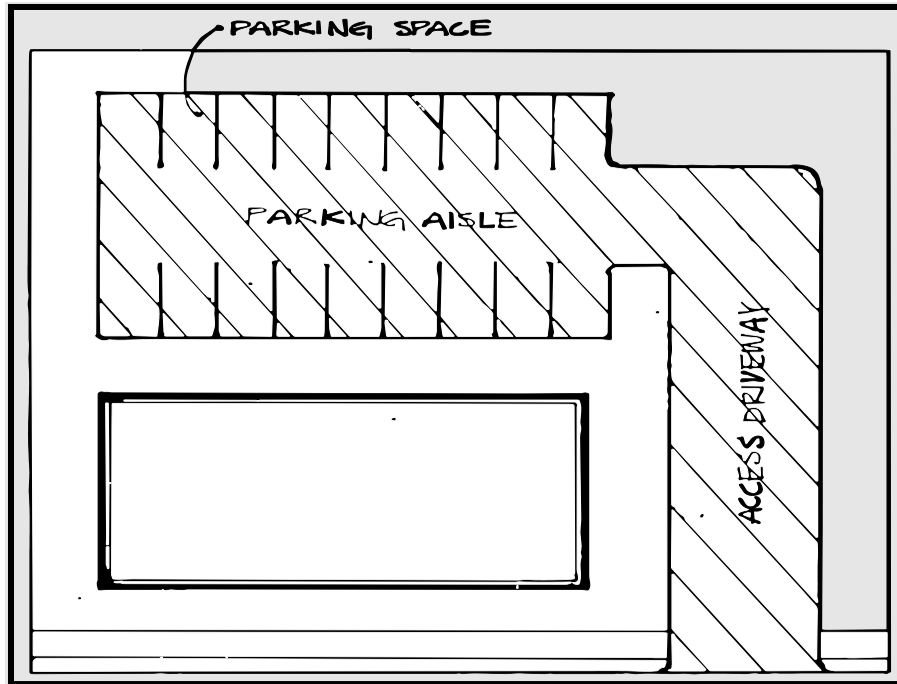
Parking Area Components shown above include: Parking aisle, access driveway, parking space and parking area shown as crosshatch pattern.
